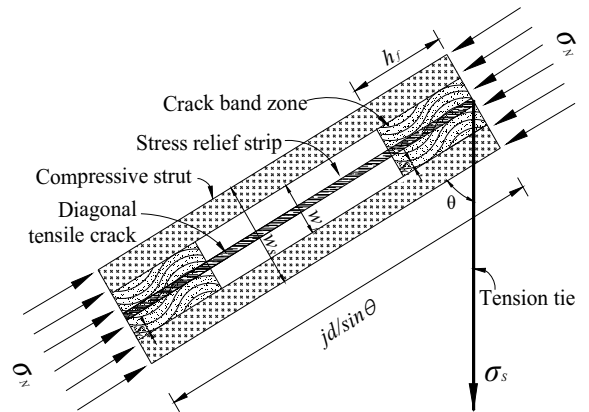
Stress relief strip and crack band zone in shear walls without shear reinforcement
